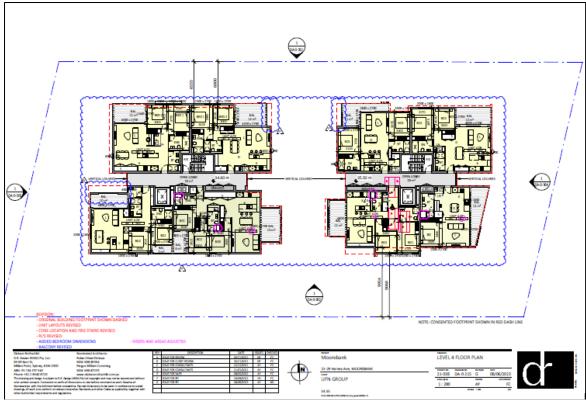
Level 4 Floor Plan - Revision G – S4.55
